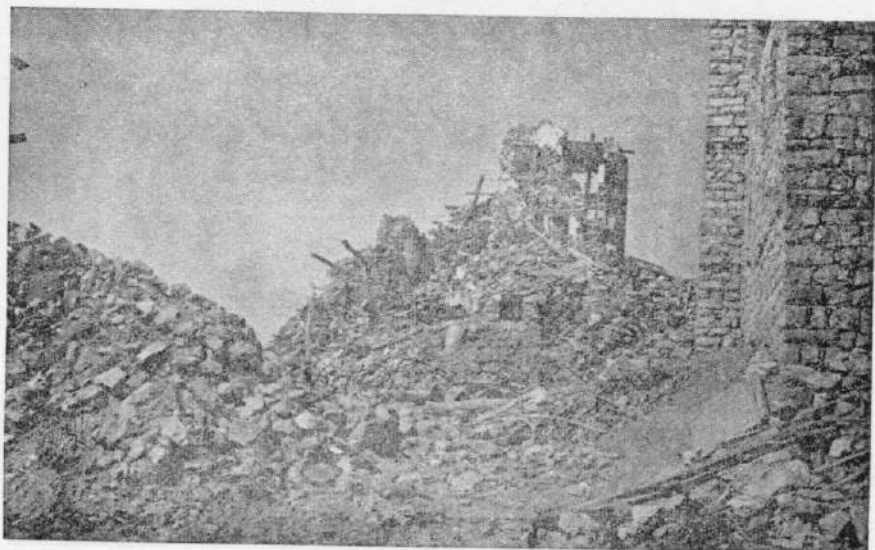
Collapse of houses built of random rubble stone in village Dohran.
